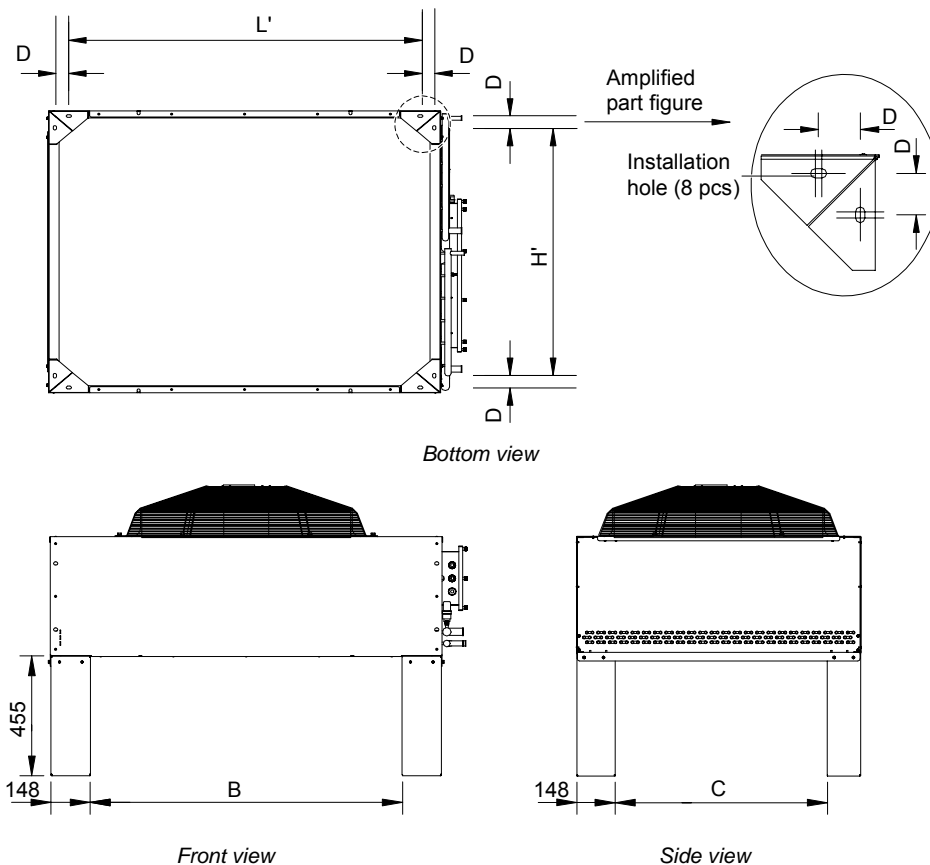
Mounting base dimensions for horizontal installation (unit: mm)
